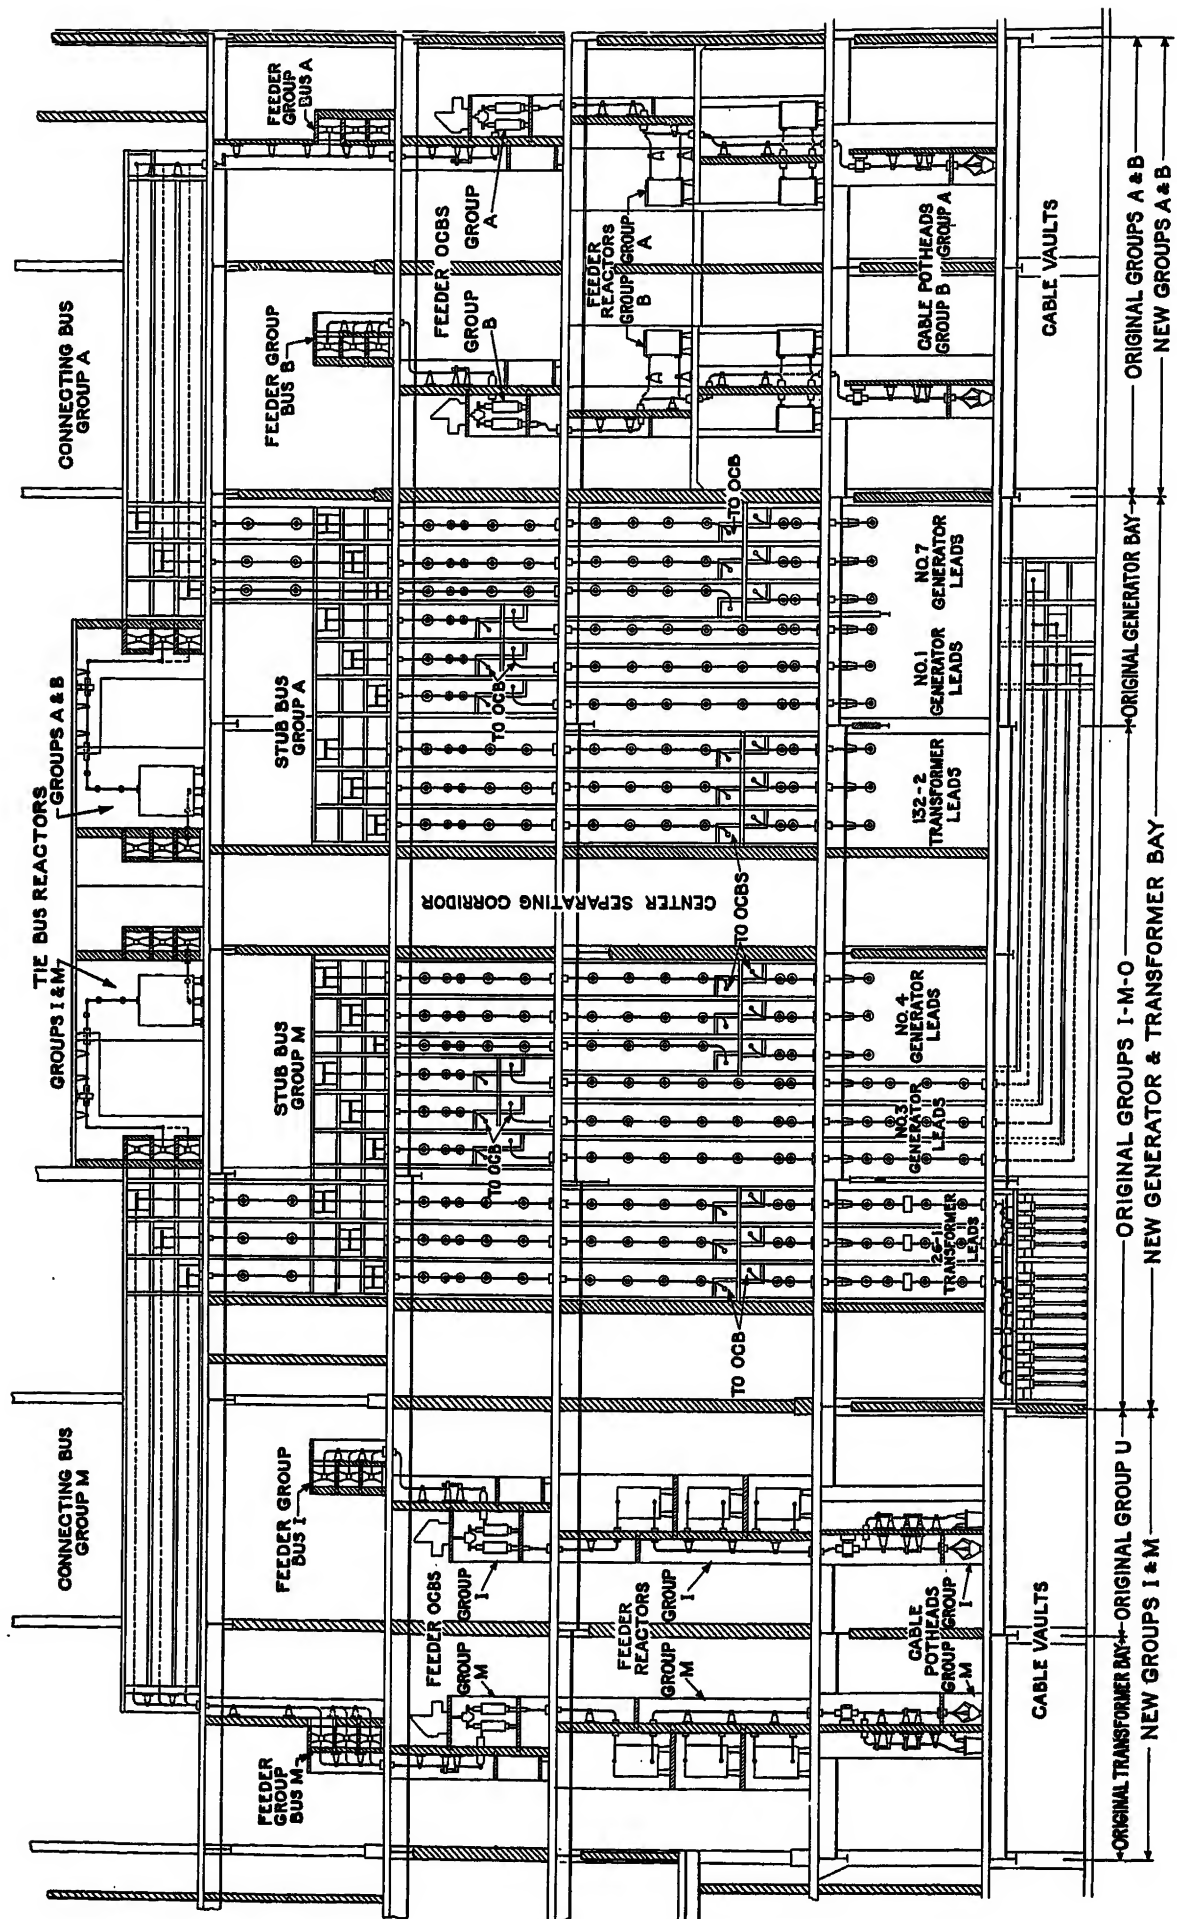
Thirteen-kilovolt switch house—longitudinal section
